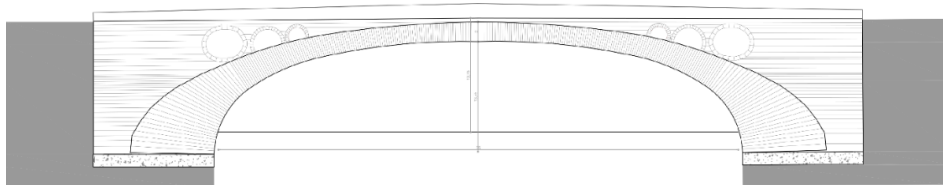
Longitudinal cross-section of the Devil's bridge on the Sele river with the internal geometrical layout
